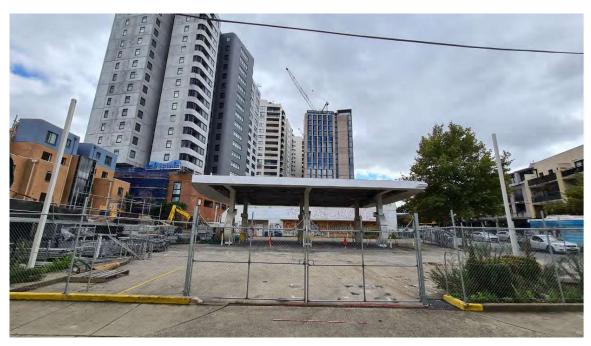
North facing view of study area showing electric poles and gardening areas aboveground level.
